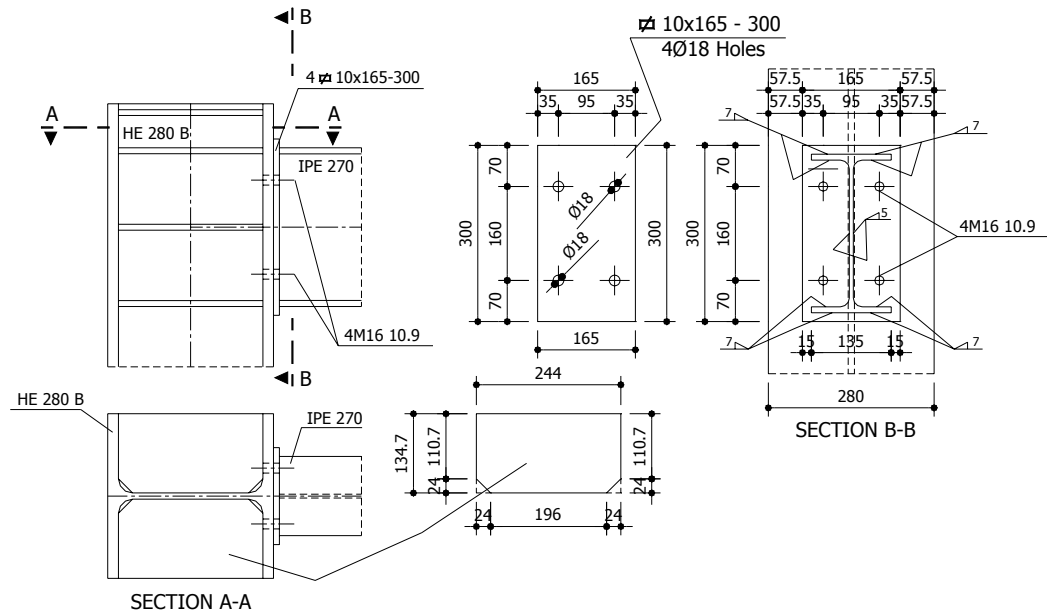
Beam-to-Column Joint Detail with Flush End Plate (dimensions in mm)
